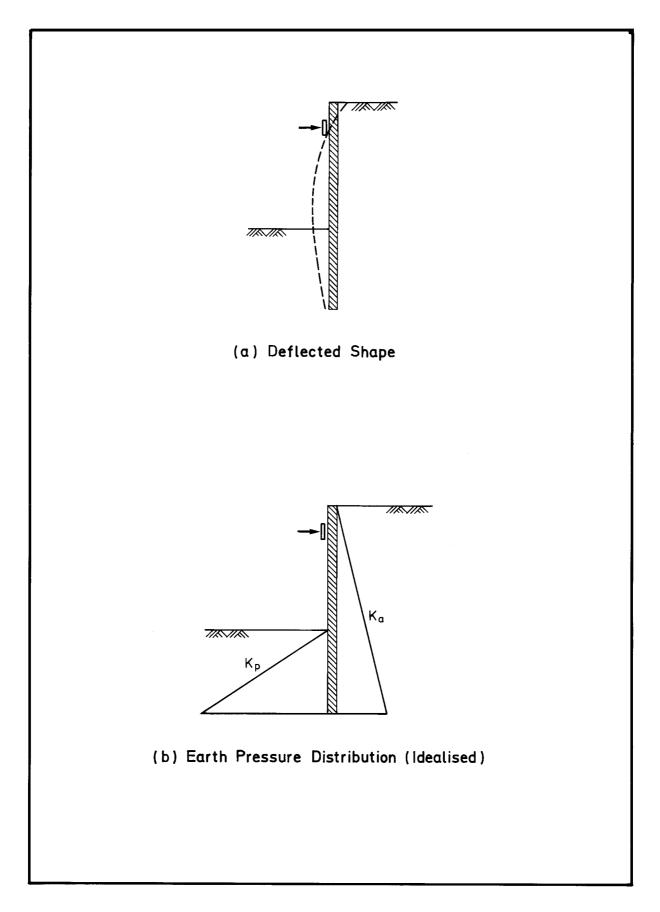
Free-earth Support Conditions for a Propped Wall (Padfield & Mair, 1984)
